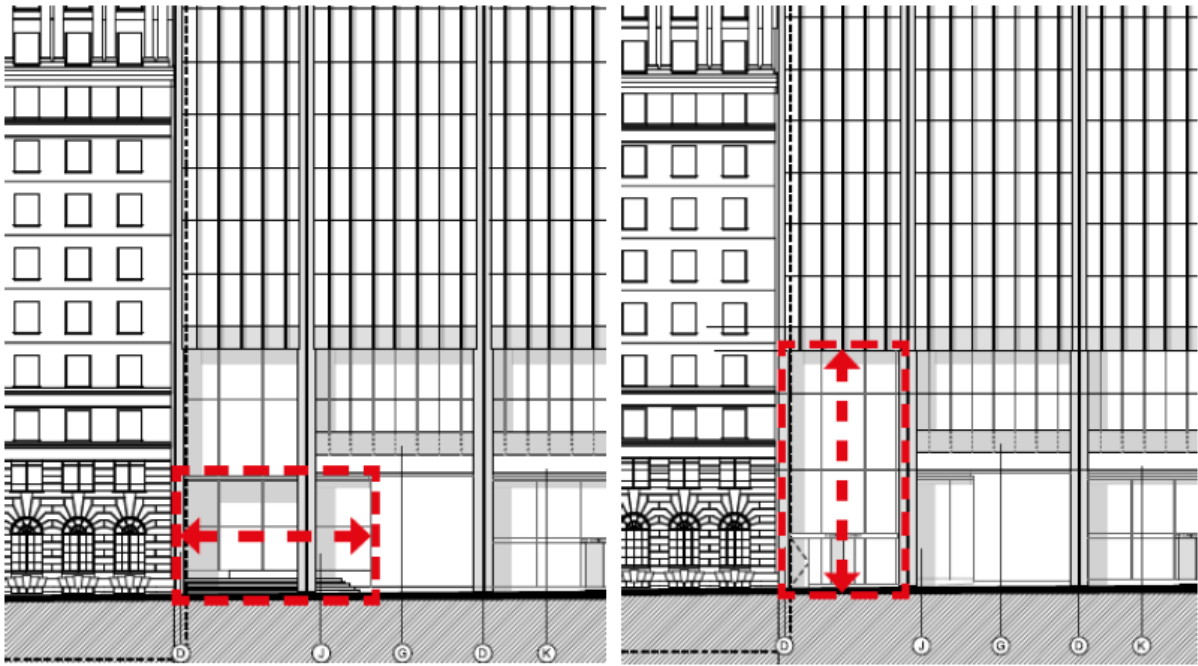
| Approved Carrington Street entry (left) and proposed Carrington Street entry (right)
